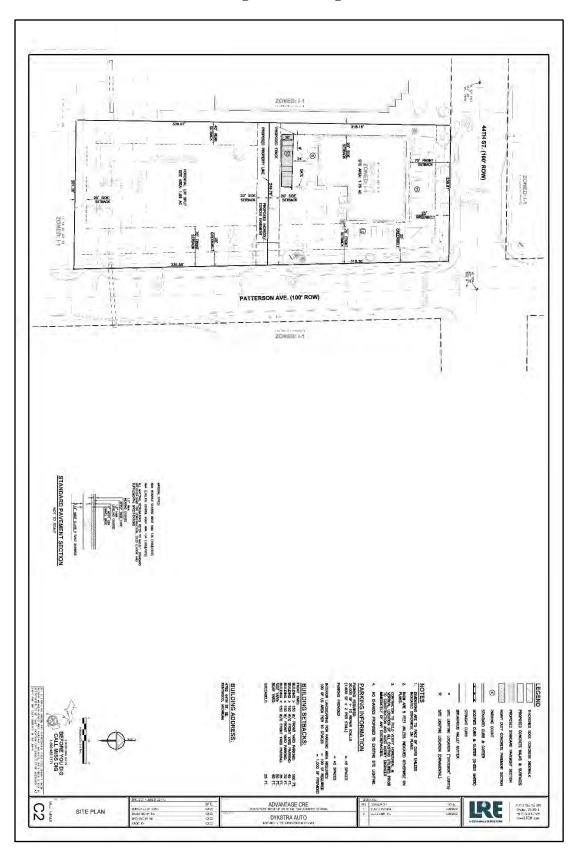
Case 20-22 Site Plan Findings of Fact (Page 2 of 2)
